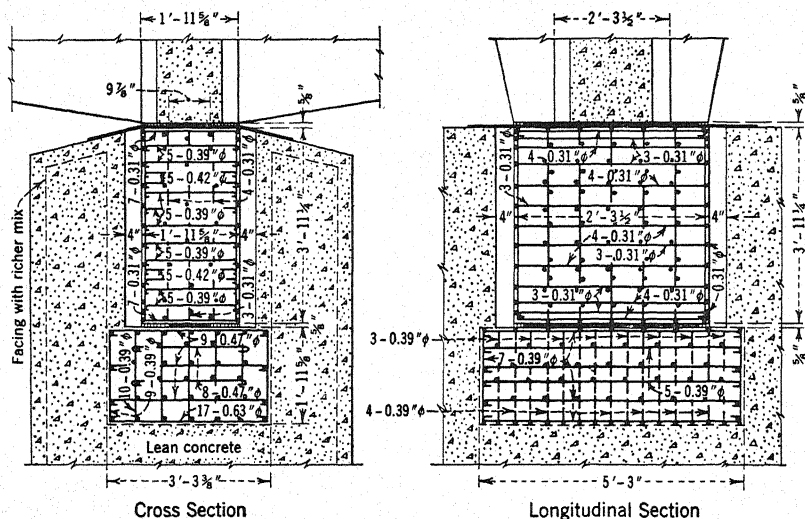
Reinforced Concrete Rocker Bearing, Lindau Bridge. (See p. 382.)
